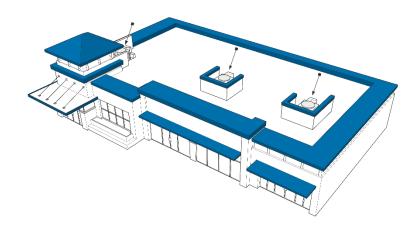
Roof-Mounted Screening⁷⁴⁸
